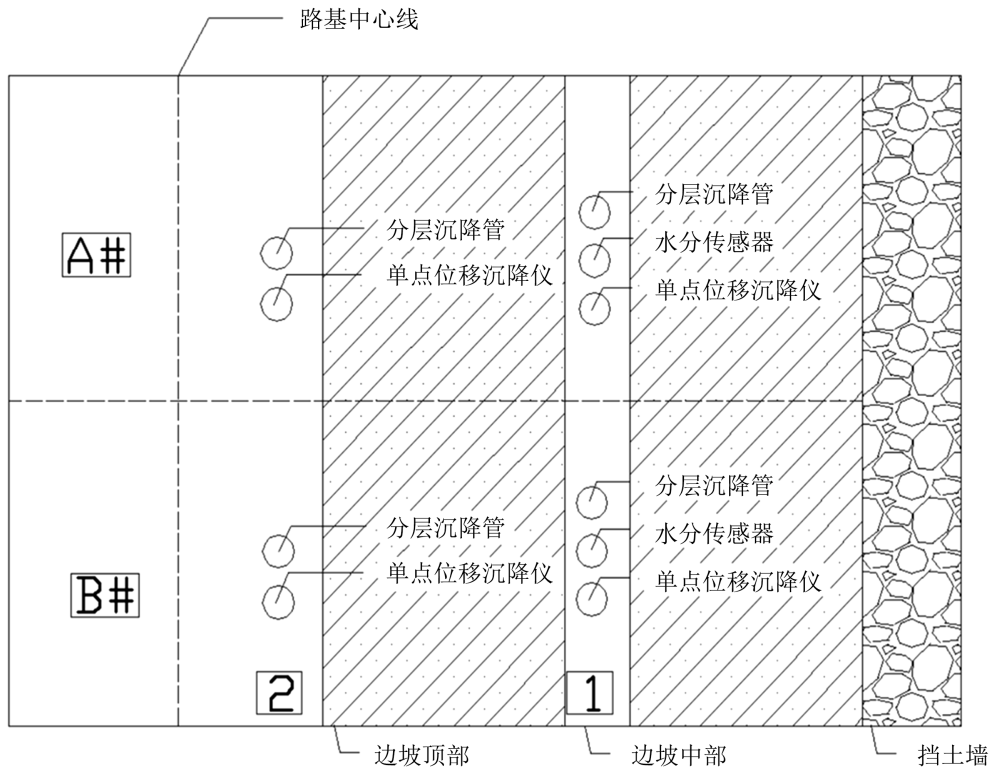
Layout plan of the overall monitoring instrument for the high-filled embankment
